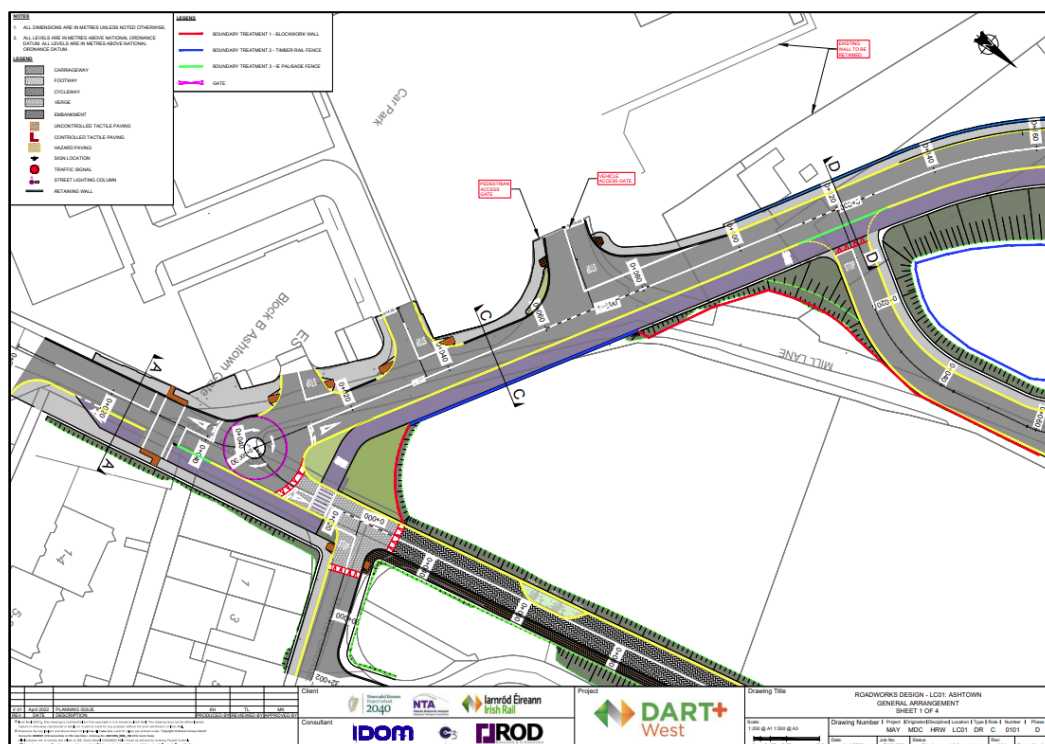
Draft Railway Order Drawing No. MAY MDC HRW LC01 DR C 0101 D for example (many other drawings have no dimensions).
